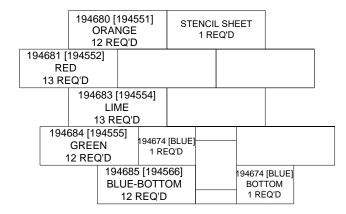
Wall Sheet Layouts — 36' CIRC Bins
